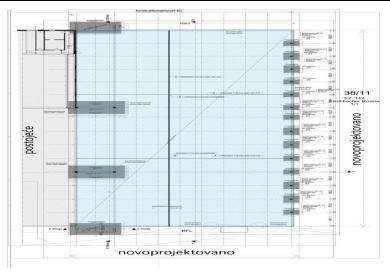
Disposes of the foundations of a new hall and a new bridge for the construction of the construction
